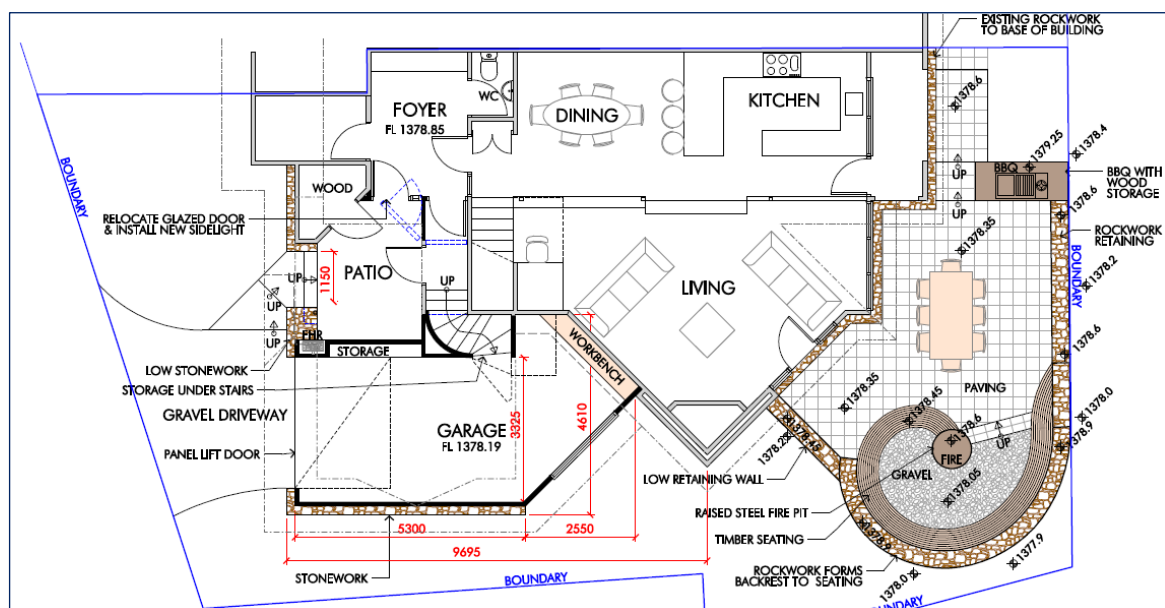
| Proposed ground floor plan (Source: Applicant's documentation)
